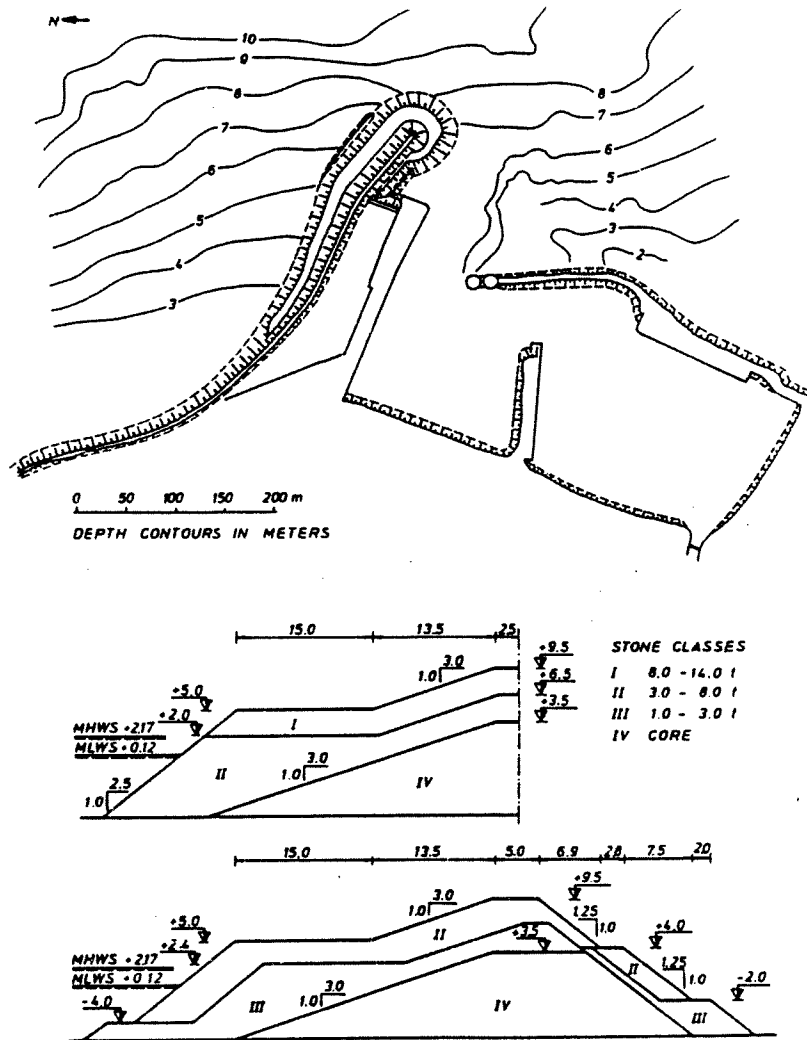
Layout and cross-section for the Bolungarvik breakwater. The upper cross-section is from the roundhead and the lower from the trunk section.
